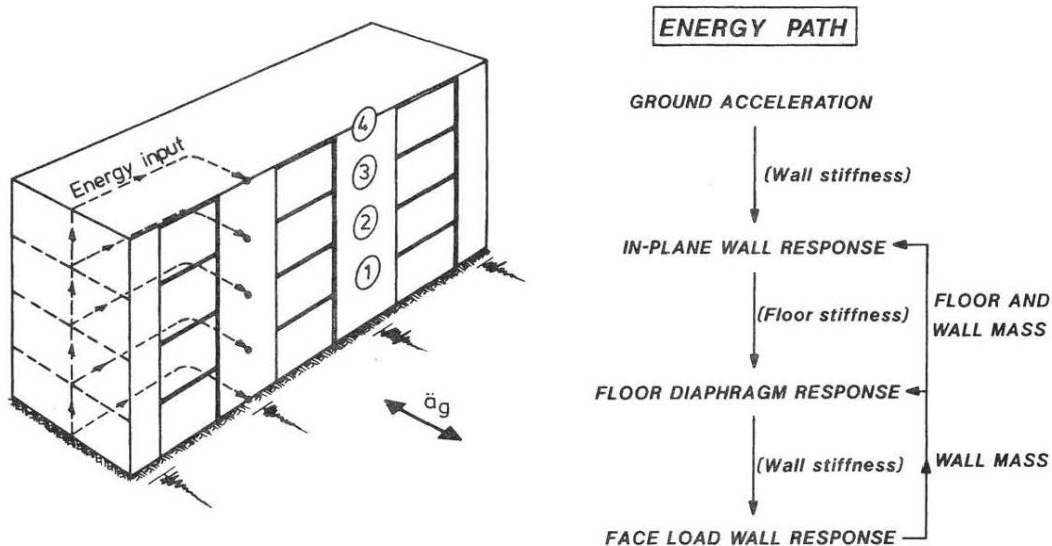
Seismic load path in an unreinforced masonry building ([211] p. 194).
